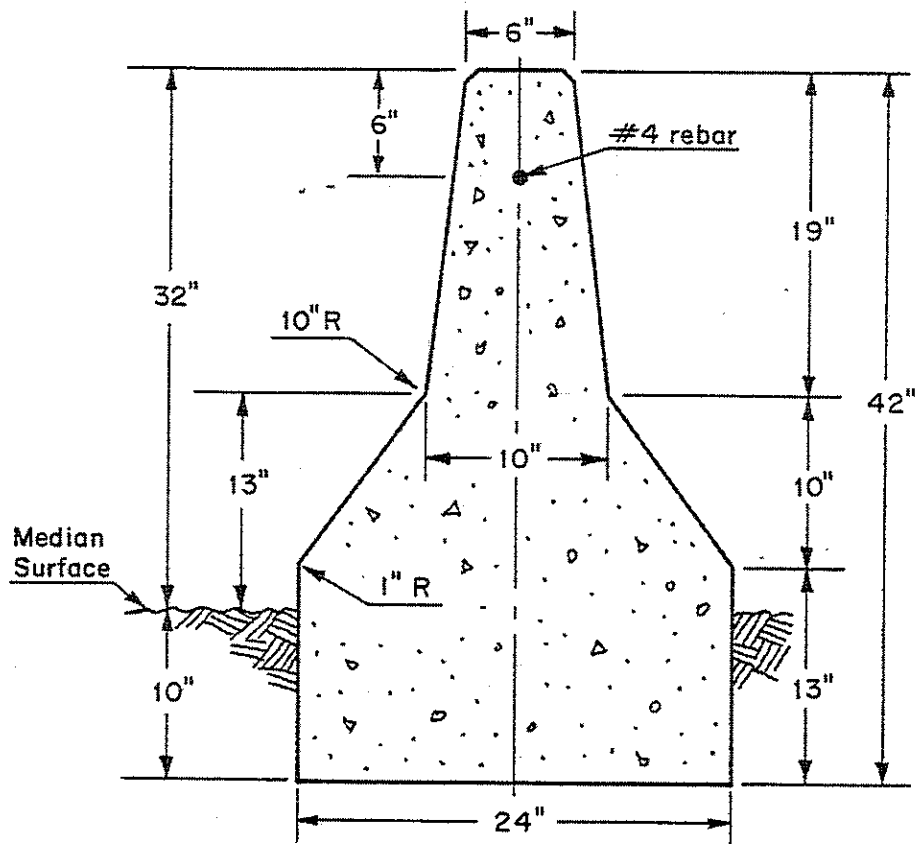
, TYPICAL SECTION OF CONCRETE BARRIER TYPE 50
